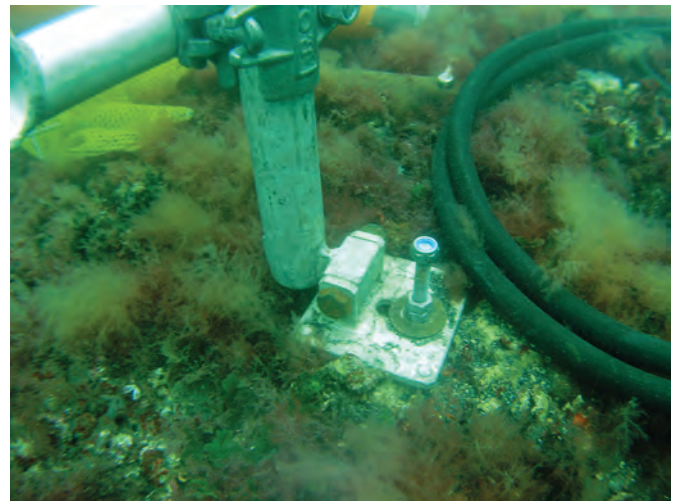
Feet clamped to frame and fixed to concrete with an expansion bolt.
